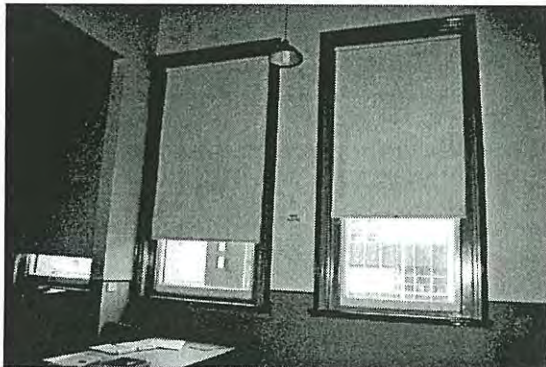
Interior, Office (spaces FF04-05). View looking west showing original timber framed double hung windows with moulded timber architraves.
